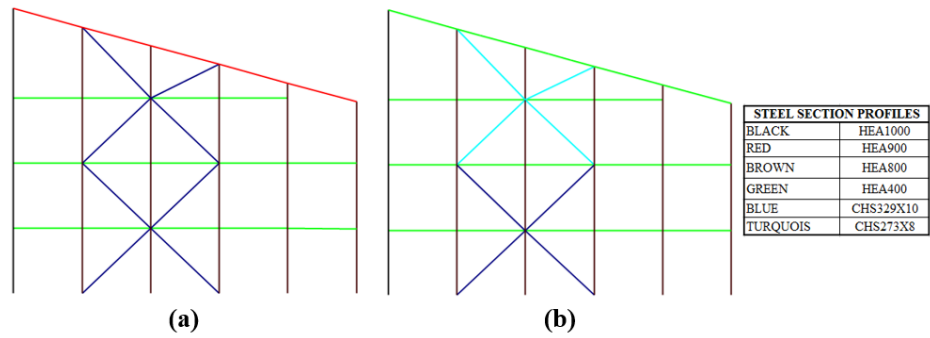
Steel Sections of the Tie-beams, Diagonals and Crane Support Columns
